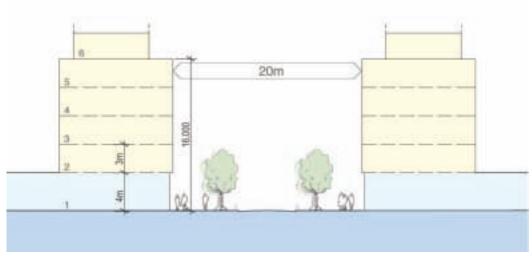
FOUNTAINBRIDGE - Indicative Sketch Along Canal
